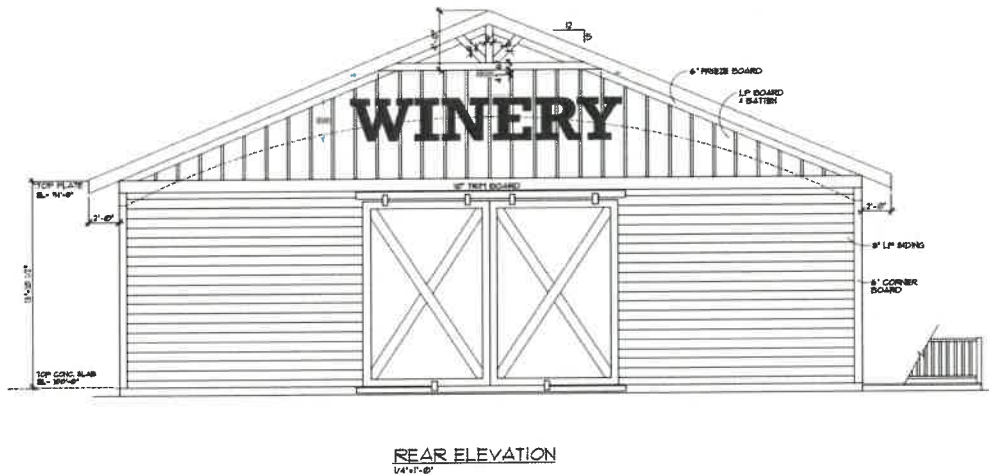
East/rear elevation of tasting/production building with approximate size and location of proposed signage (Note Staff superimposed the Winery Sign on the architectural elevation at the approximate location based on the images submitted.)
